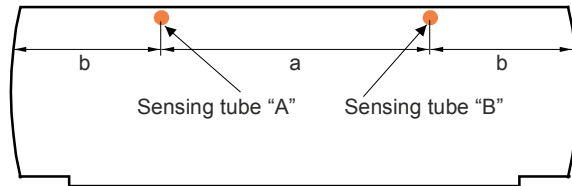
Tunnels with flat ceiling, over 3 traffic lanes
